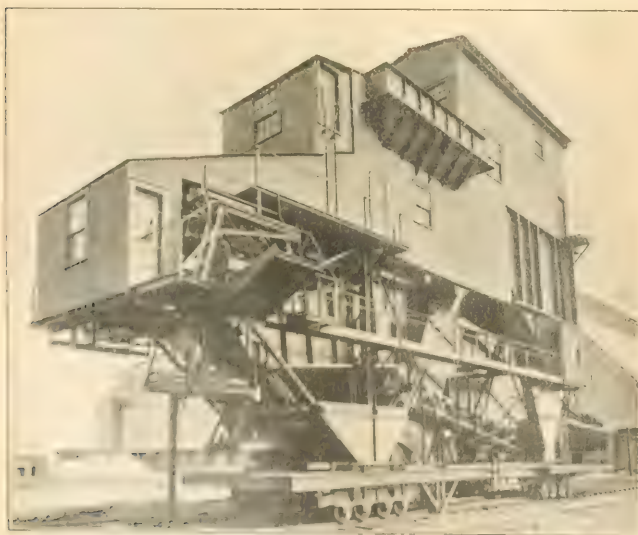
COOLING PIER AT BALTIMORE, ELEVATION.
